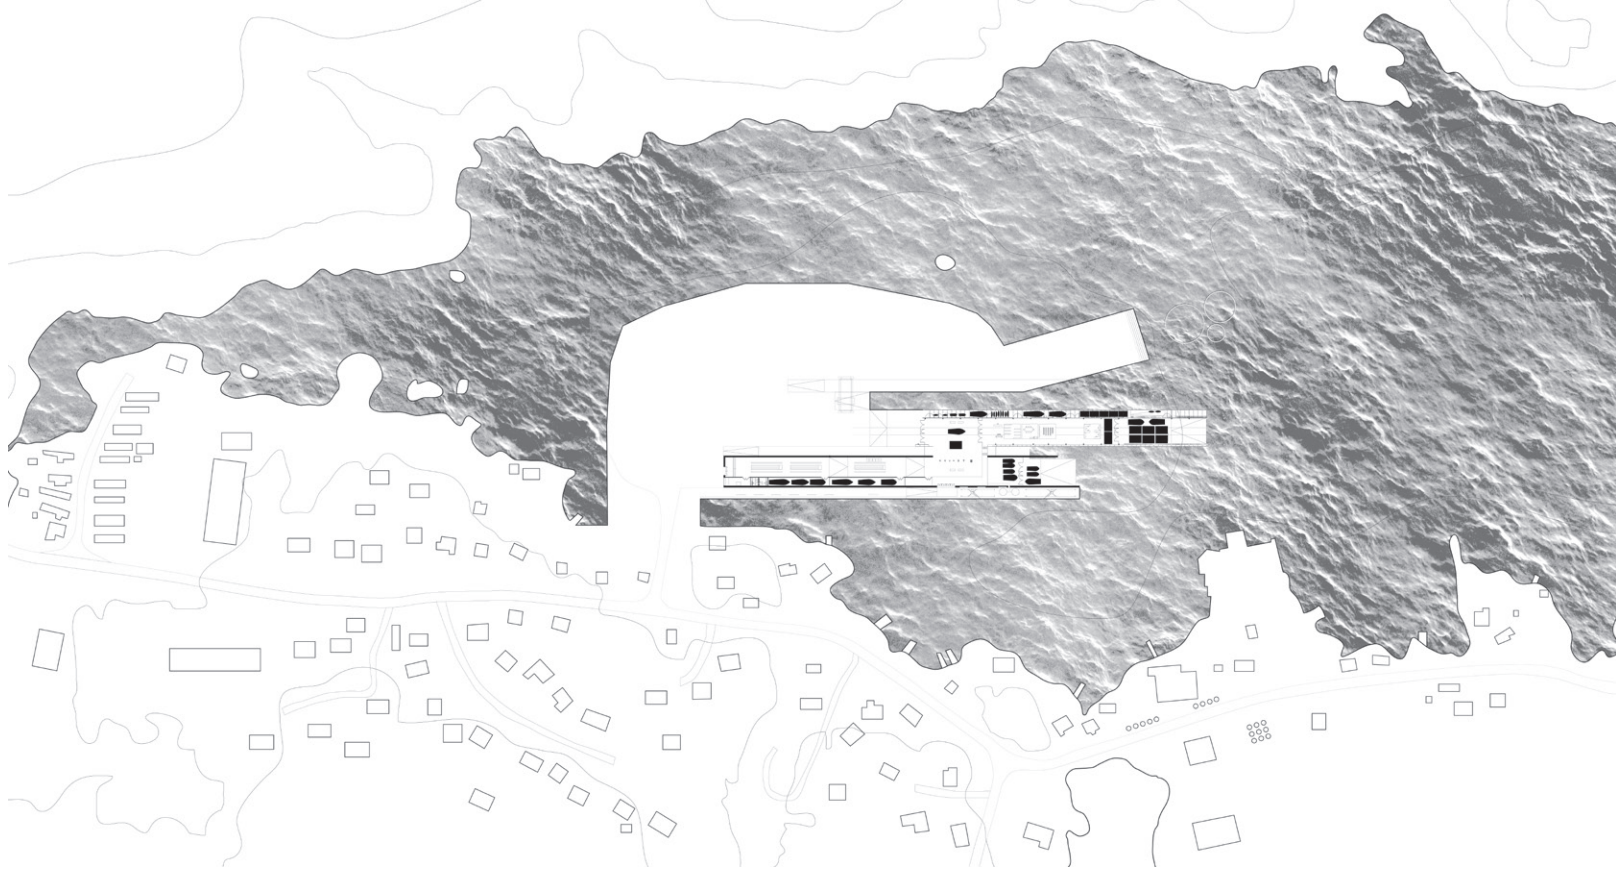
Burgeo Facility Plan in the winter and expanded in a successful future.
